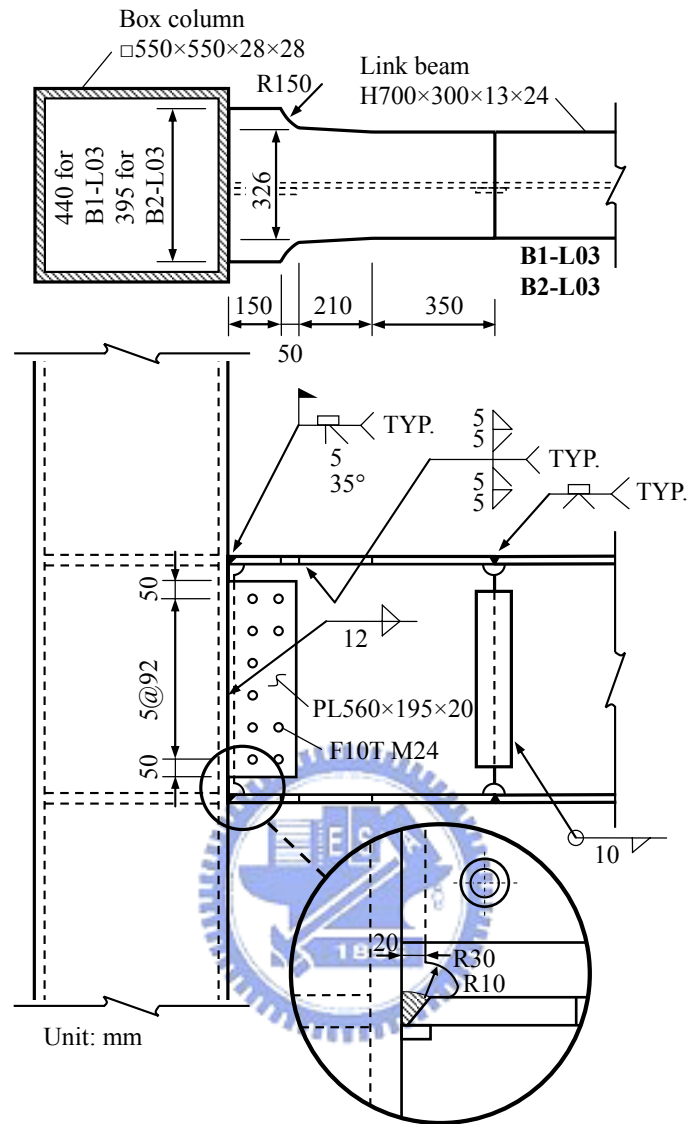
Connection details of specimen B1-L03 and B2-L03.
